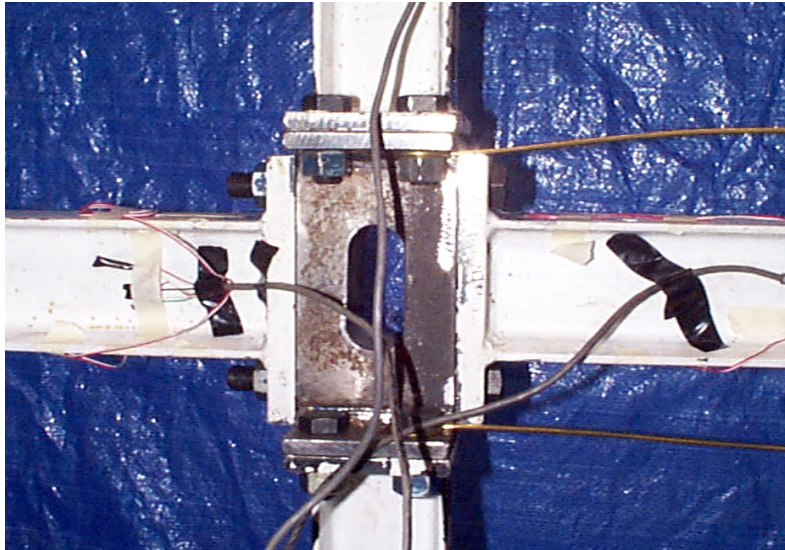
Instrumentation for Beam-Column Connection Specimen (Front View)
